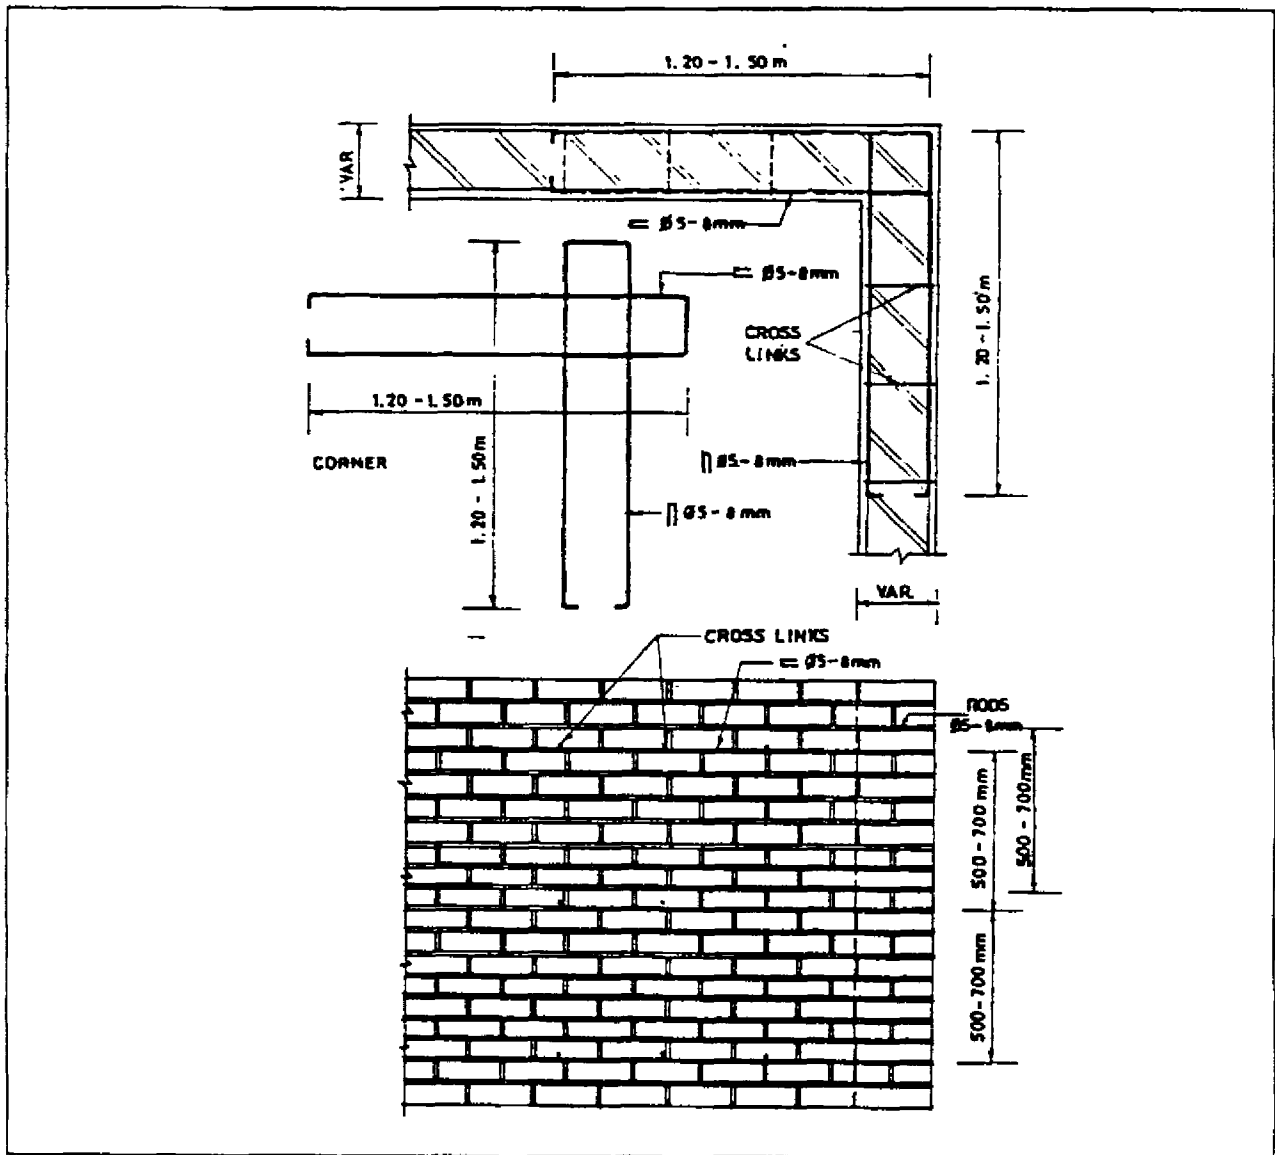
Horizontal Reinforcement in Adjacent Joint [1]
